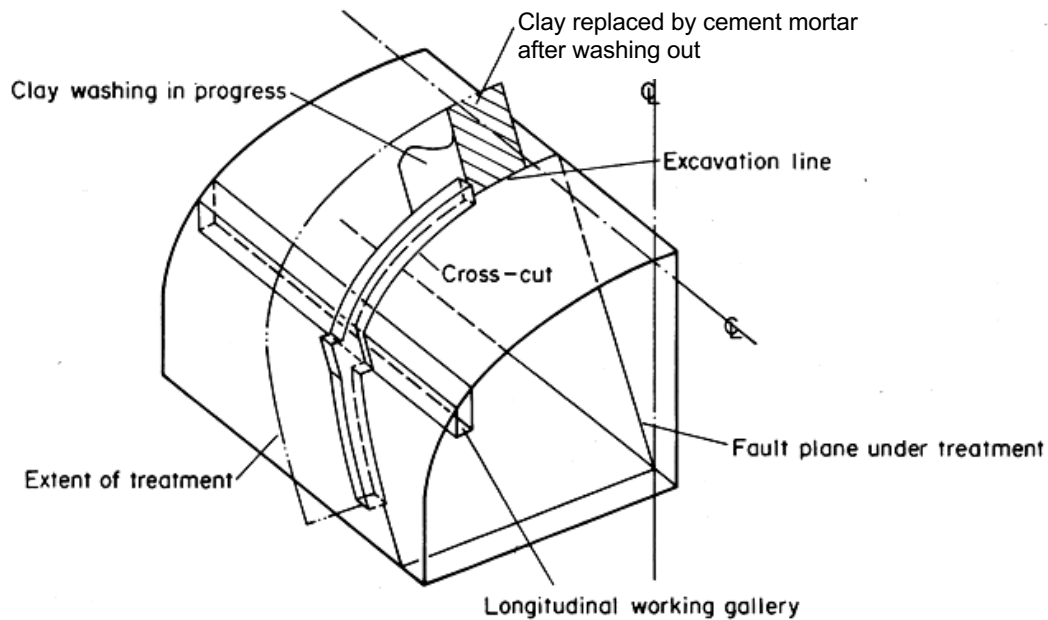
Washing and replacement of clay seams in the faults encountered in the roof and upper sidewalls of the Mingtan power cavern. This treatment was carried out from two longitudinal working galleries before excavation of the cavern commenced in the main contract.
